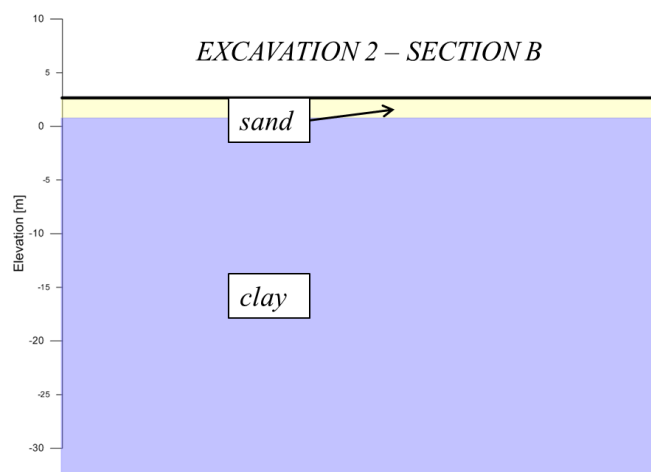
Initial soil profile for Excavation 2, for the final redrawing of the road E45.
